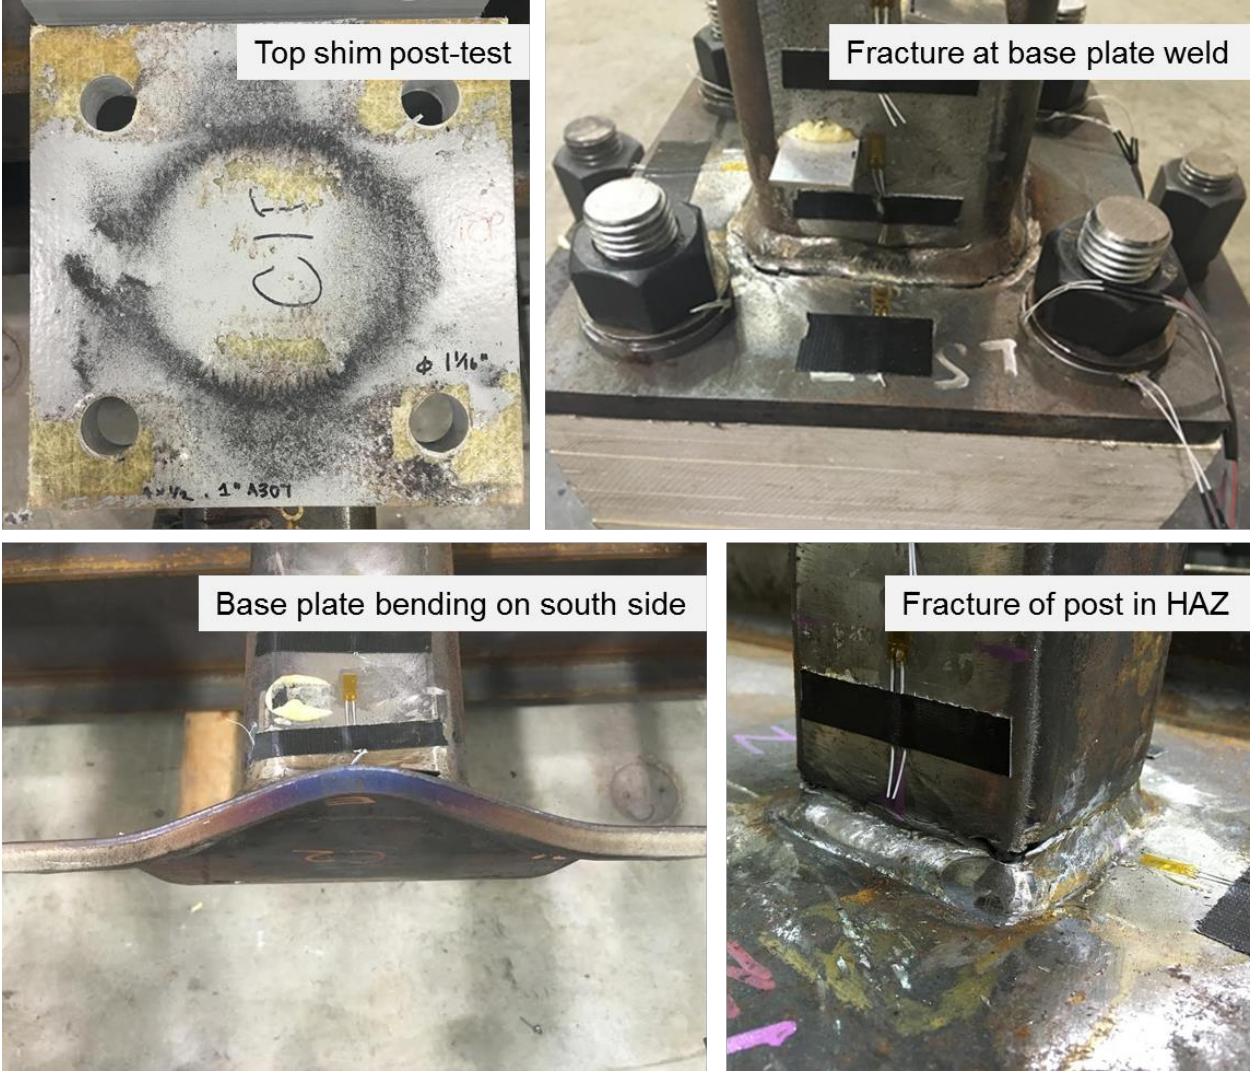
Photographs of typical failure modes for roof posts and canopy beams
